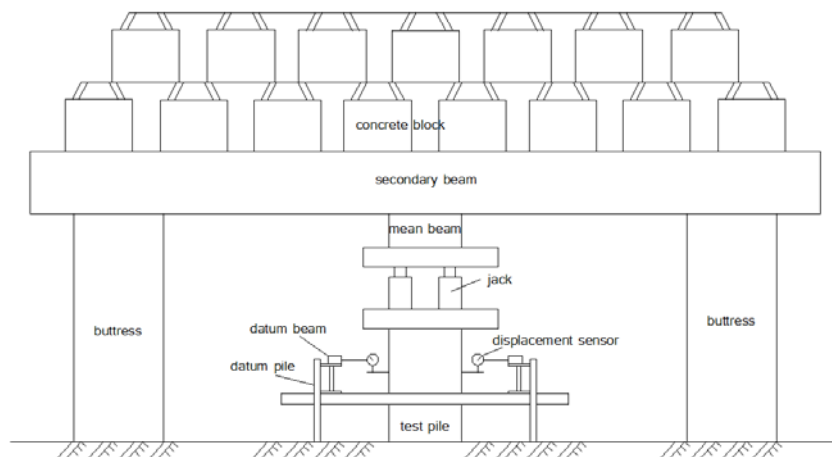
FIGURE OF LOADING PLATFORM TESTING APPARATUS
